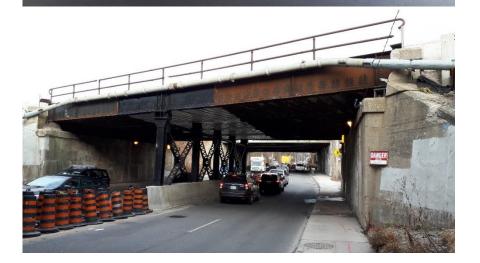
View of eastern abutment and concrete sidewalk along Parkside Drive, looking northwest
